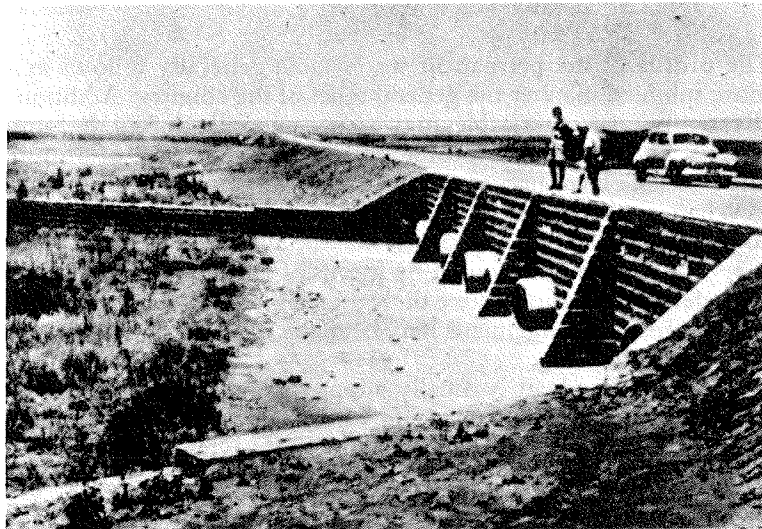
Culvert with fanned outlet to minimise erosion.
